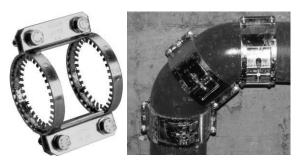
Grip collar on SMU-type joints example of parts and of assembly
